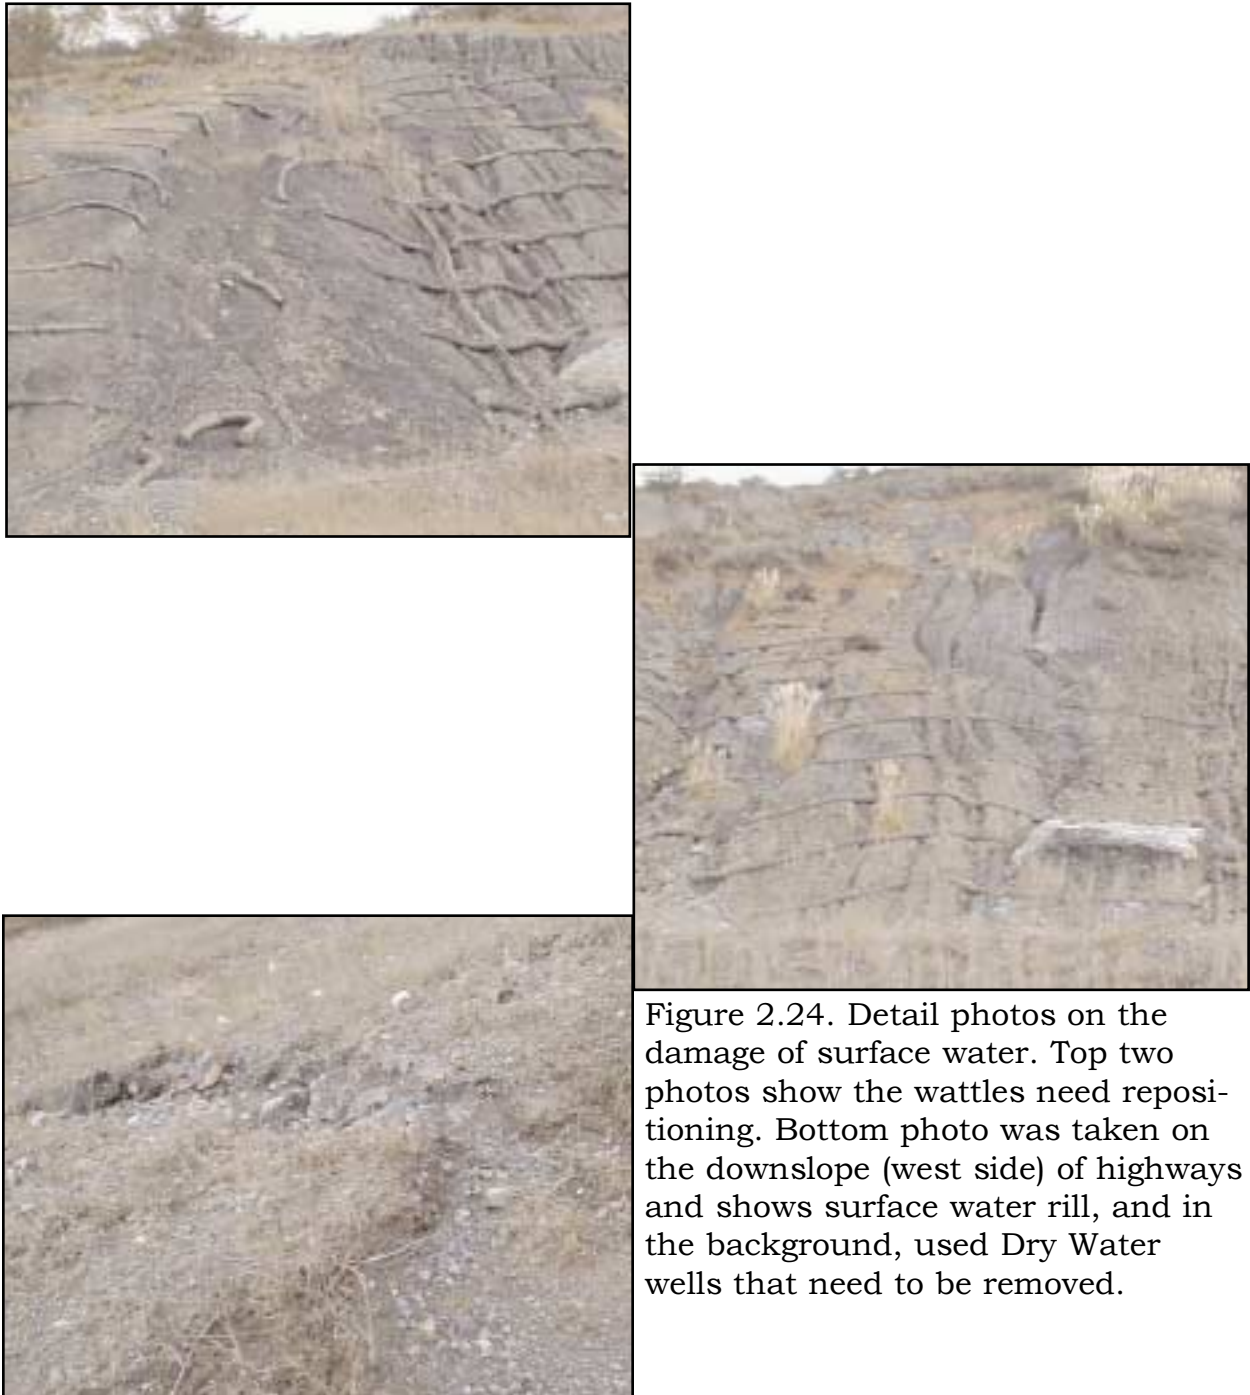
Detail photos on the damage of surface water. Top two photos show the wattles need repositioning. Bottom photo was taken on the downslope (west side) of highways and shows surface water rill, and in the background, used Dry Water wells that need to be removed.
